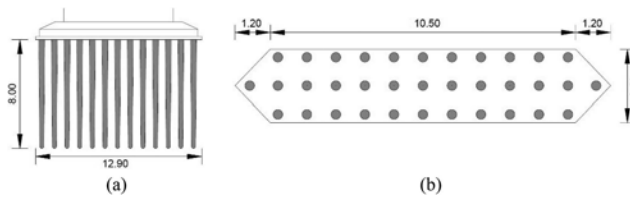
Bridge foundation [m]: (a) vertical and (b) plan views.
